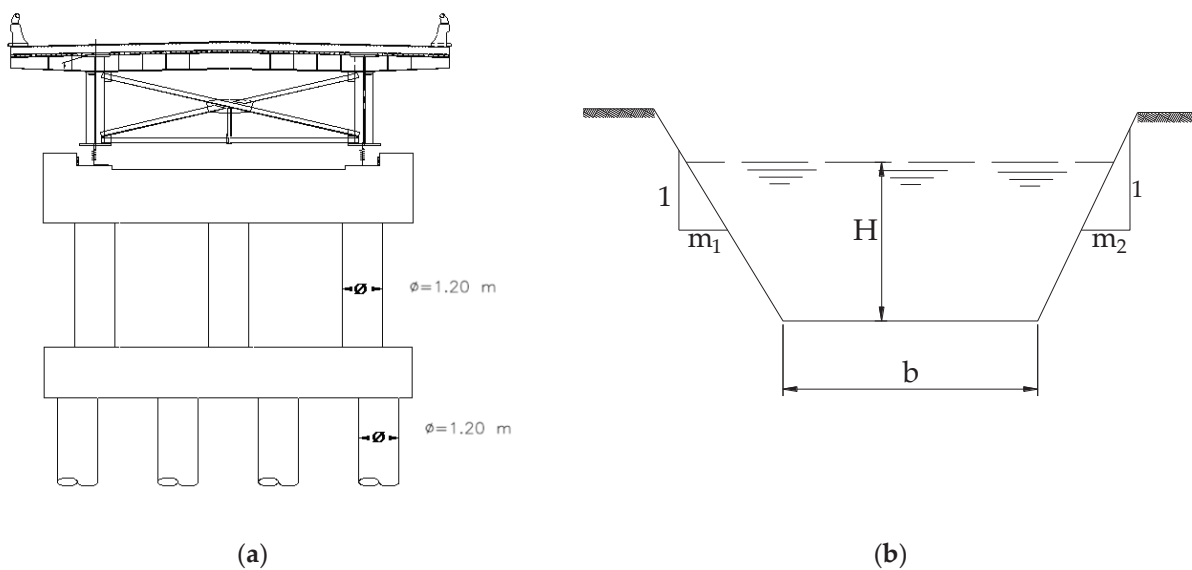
Study case: (a) typical pier of the bridge; (b) simplified cross-section of the river.
